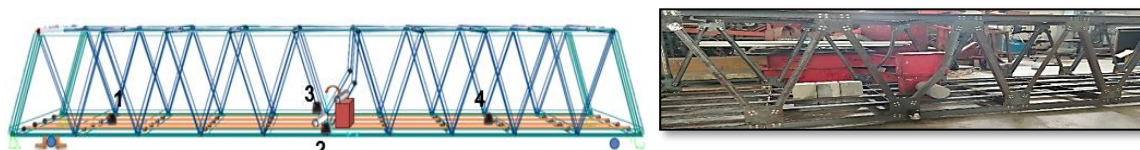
Damage Specimen with Damage at the Center Span of the Bridge.
